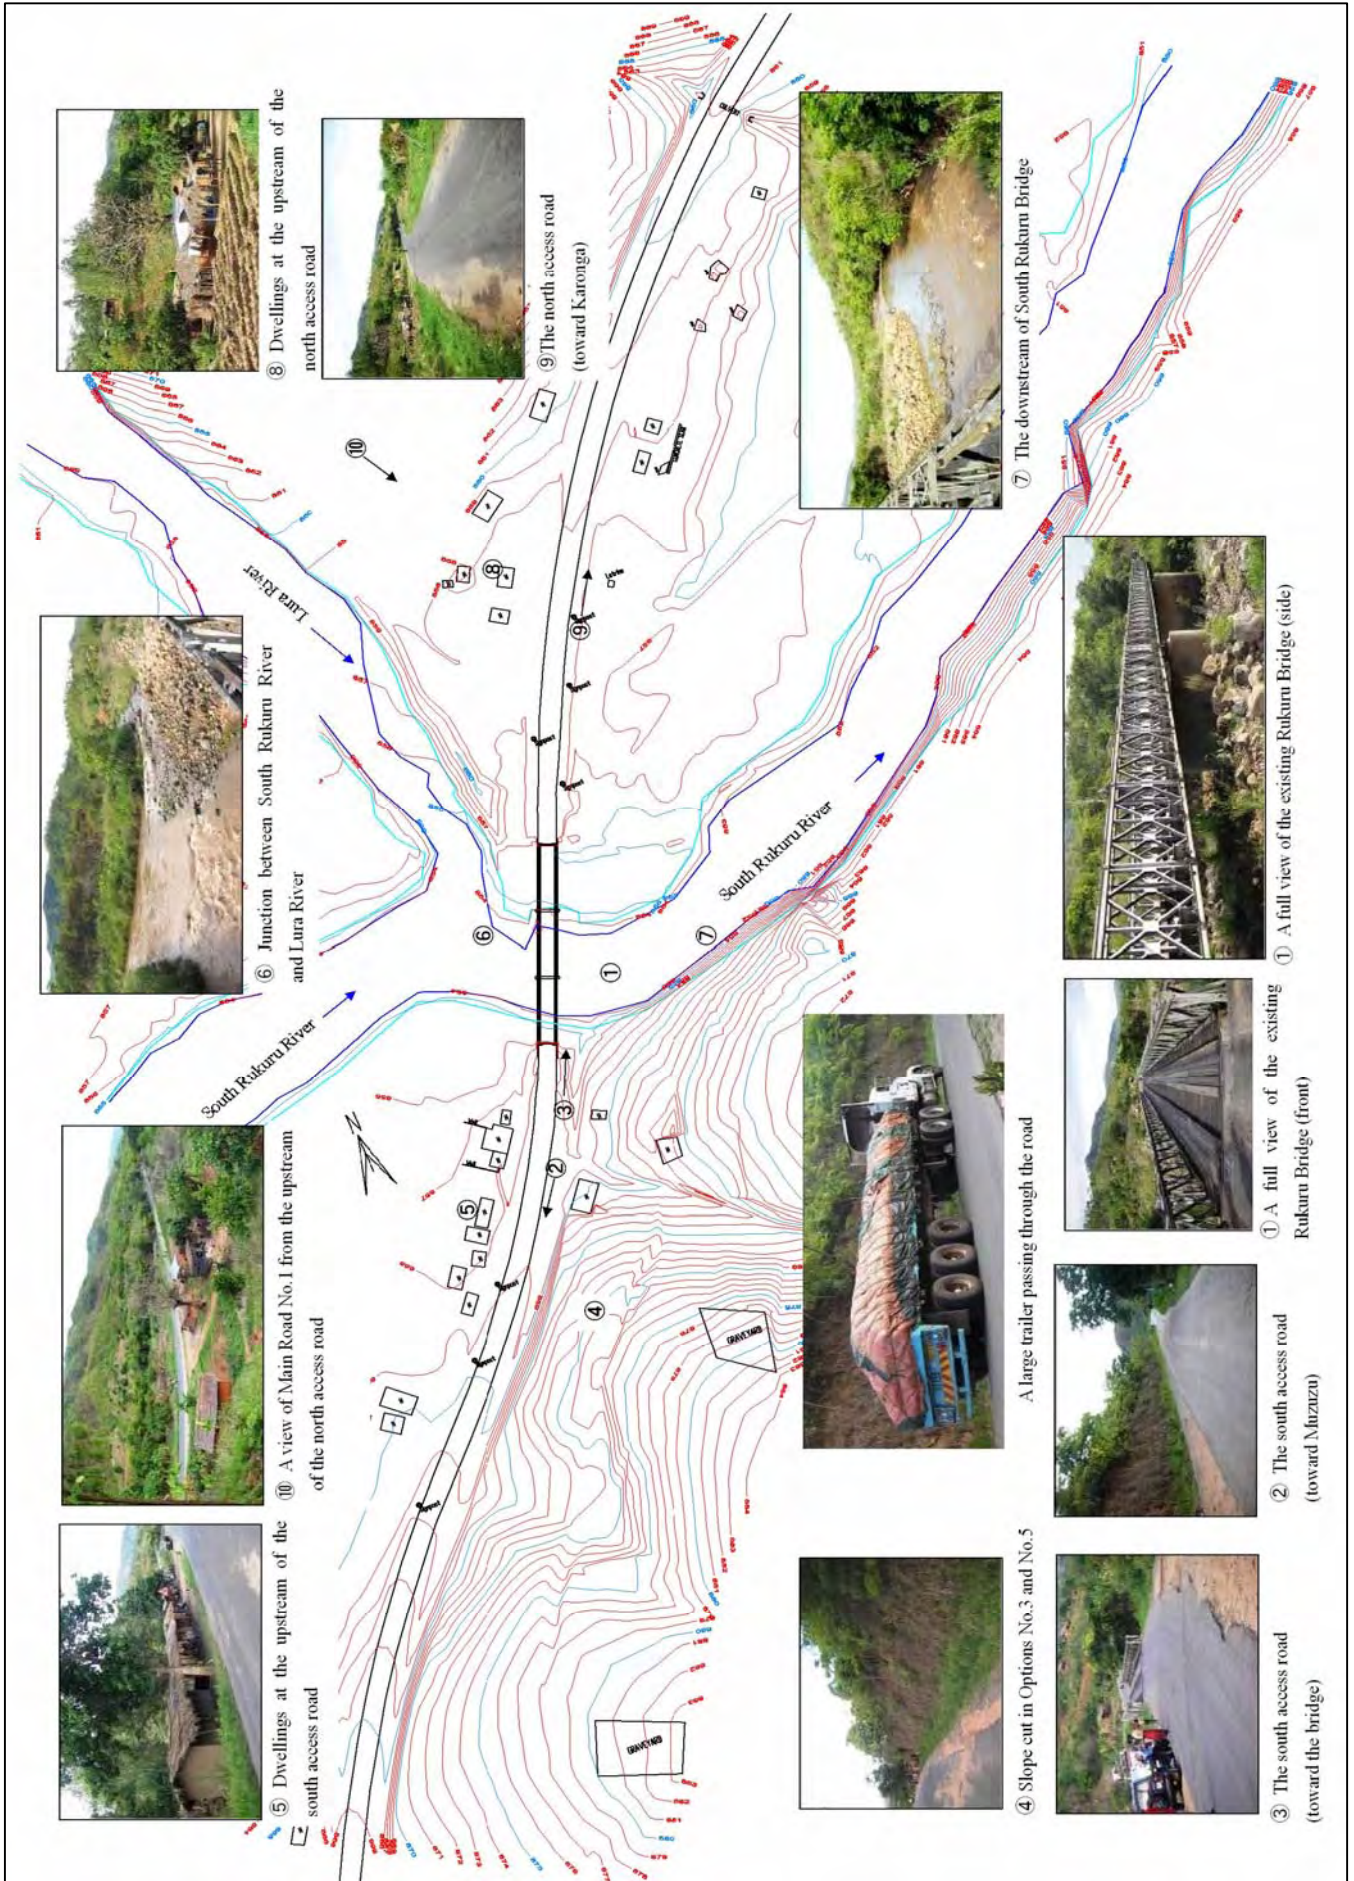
Conditions around the existing Rukuru Bridge
